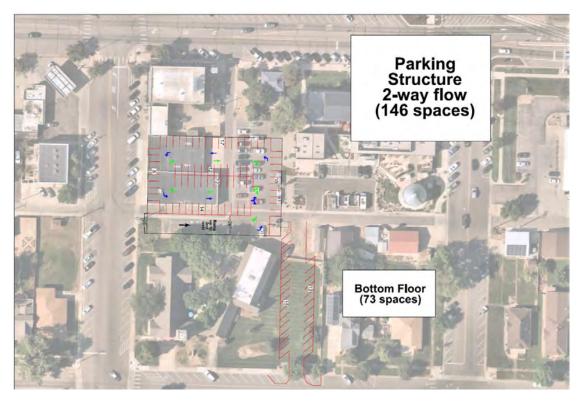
213-215 NORTH 4TH STREET GARAGE CONCEPT
